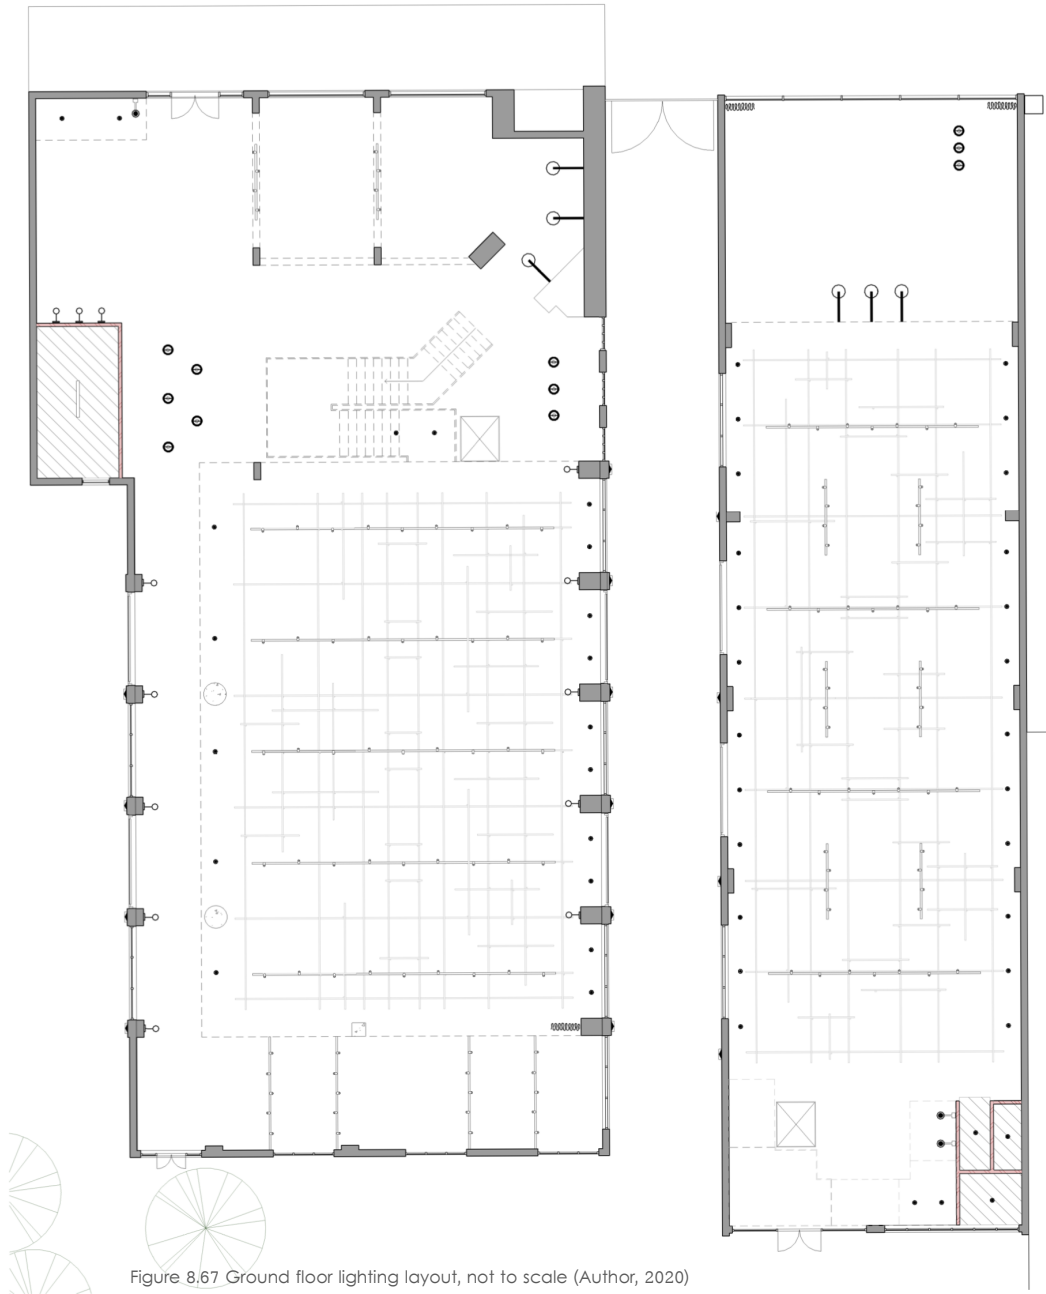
Ground floor lighting layout, not to scale (Author, 2020)
